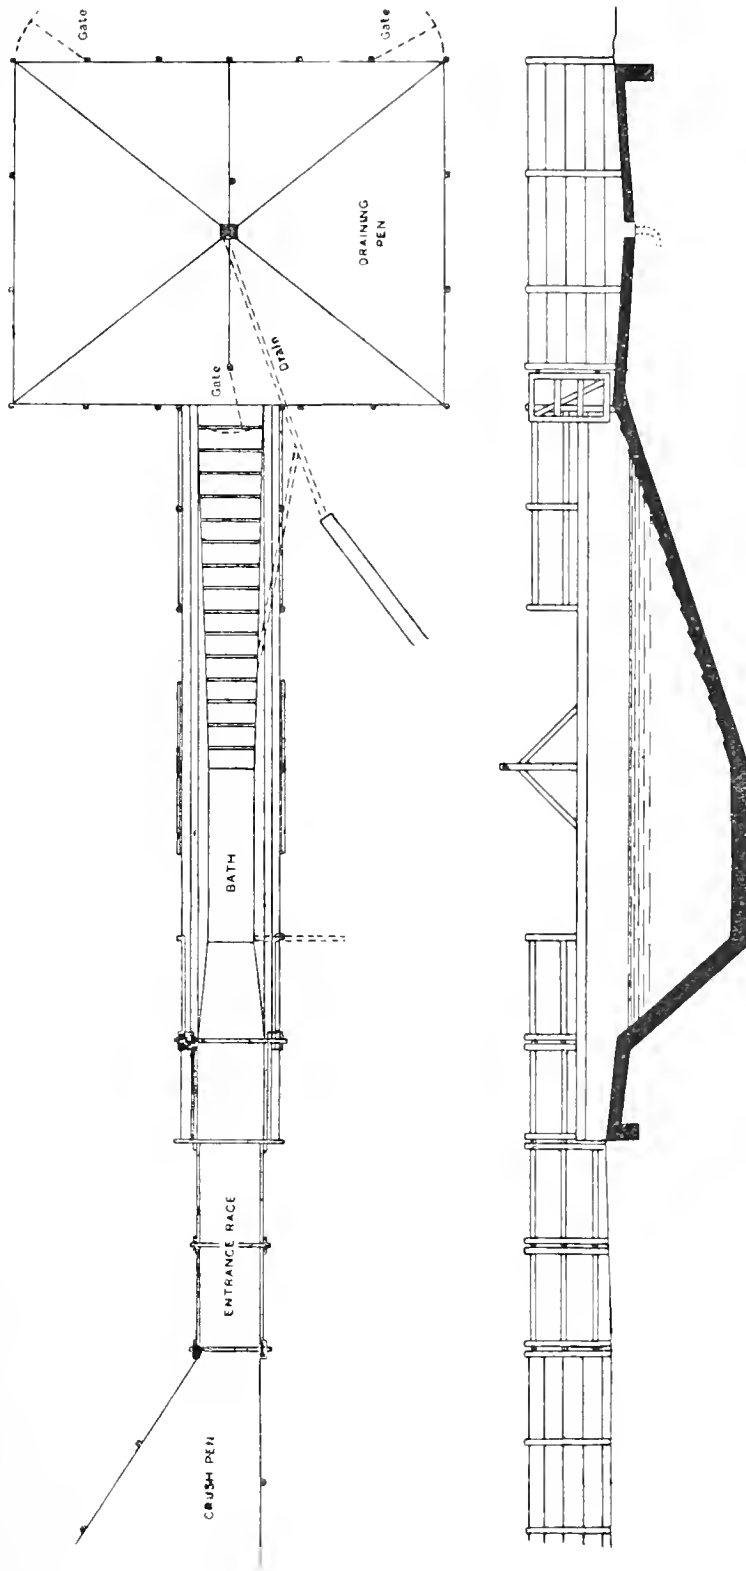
Plan and elevation of Cattle Dipping Bath.
